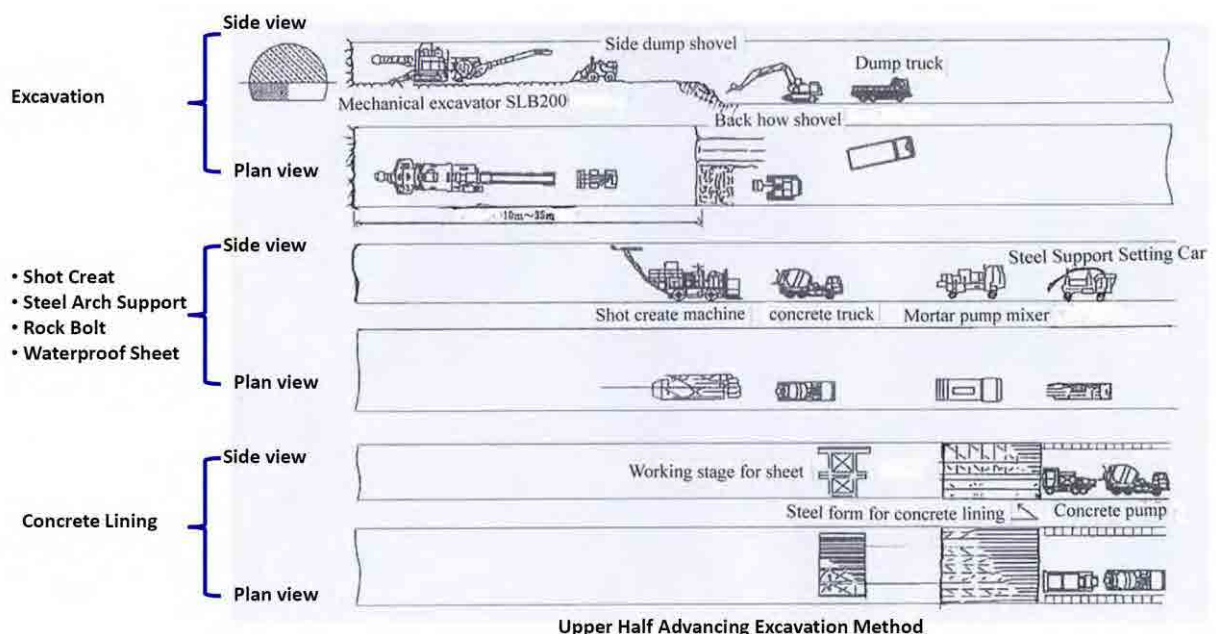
SYSTEM OF EXCAVATION METHOD
